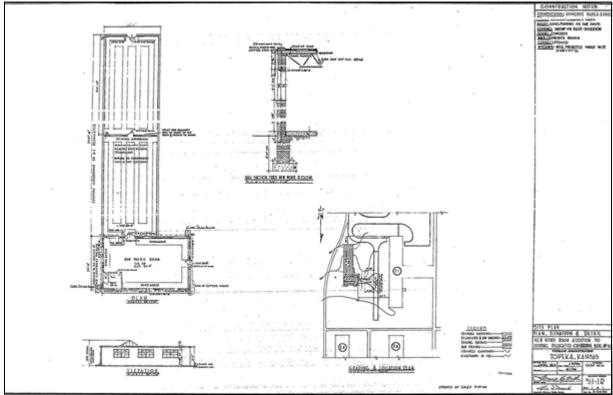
Architectural drawing for the greenhouse showing the site plan, floor plan, and "New York" room addition at the north end, 1956 (VA).
